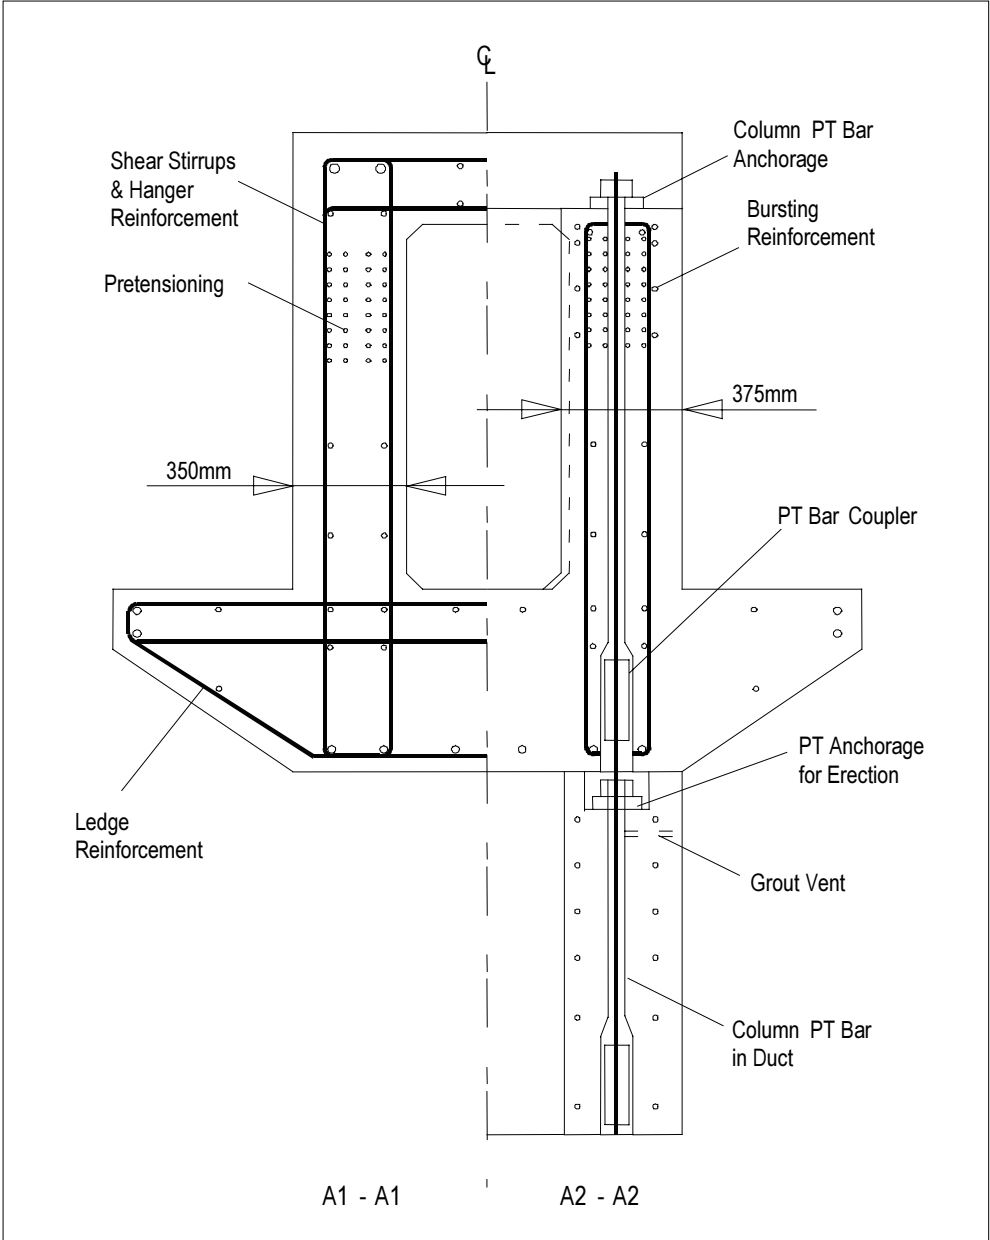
Cross-sections of cap and template for a fully pretensioned cap
